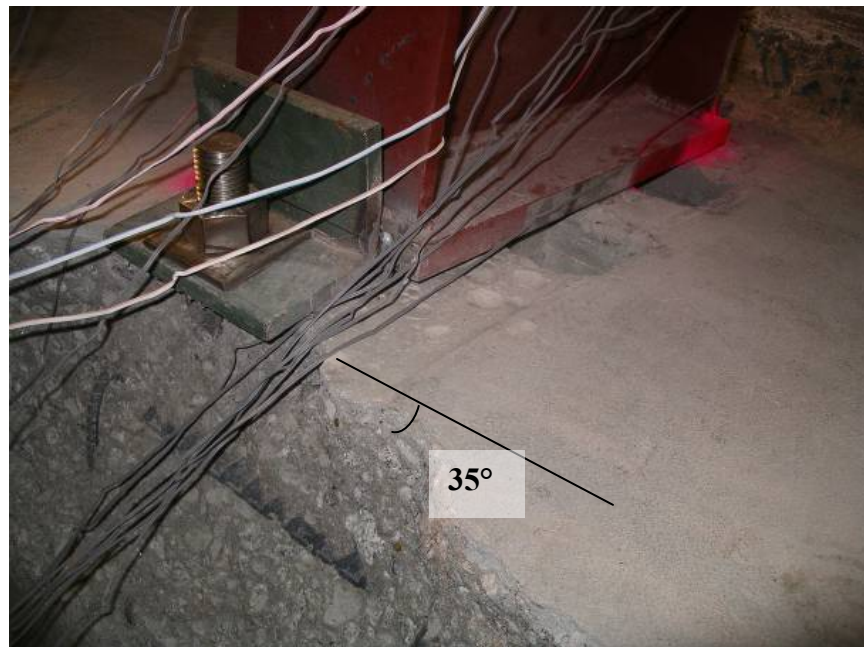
Concrete breakout at approximately 35° on reinforced concrete cap beam
